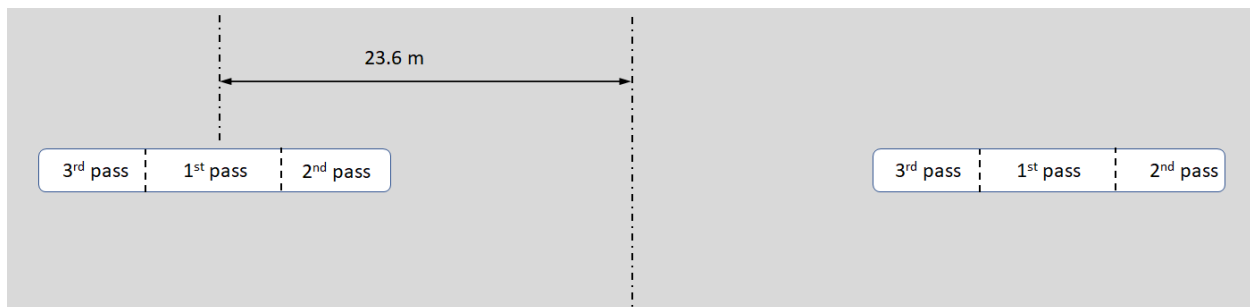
Schematic vertical section view of Rocanville long room & pillar mining (look into the mining direction)
